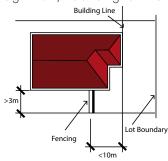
Return fencing permitted to be constructed from pre-painted sheet steel
